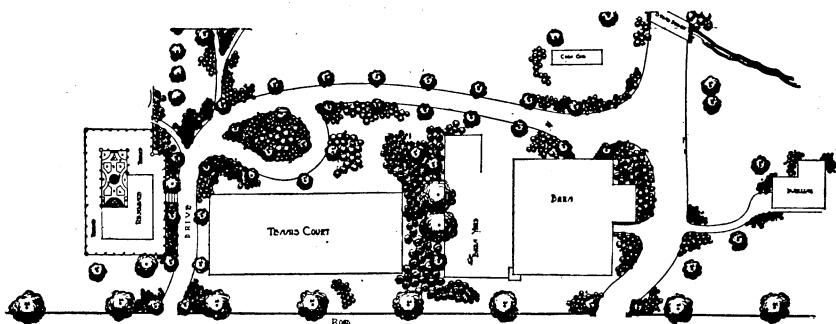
A plan for a farmstead when a good house, barn, and tenant house were already erected close to the public road.
